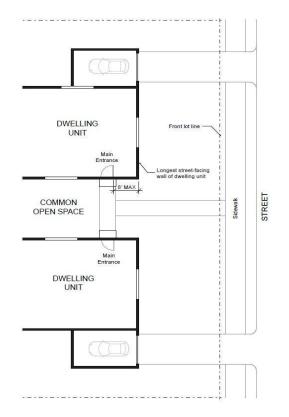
d. Main Entrance Facing Common Open Space
